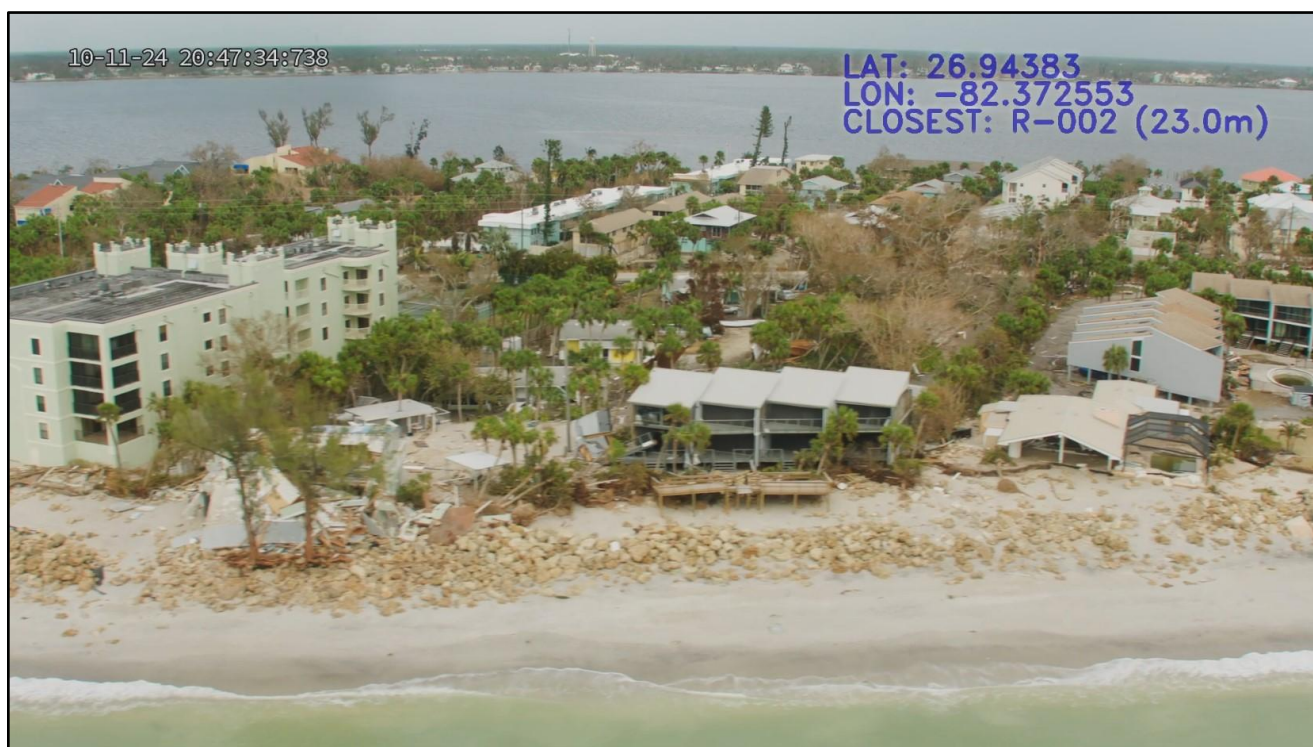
Major beach erosion, rock revetment damage and single-family dwellings destroyed by Milton at Englewood Beach near R-2.
